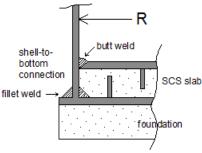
Shell-to-bottom connection of tank A ( shear studs are not drawn to scale)
